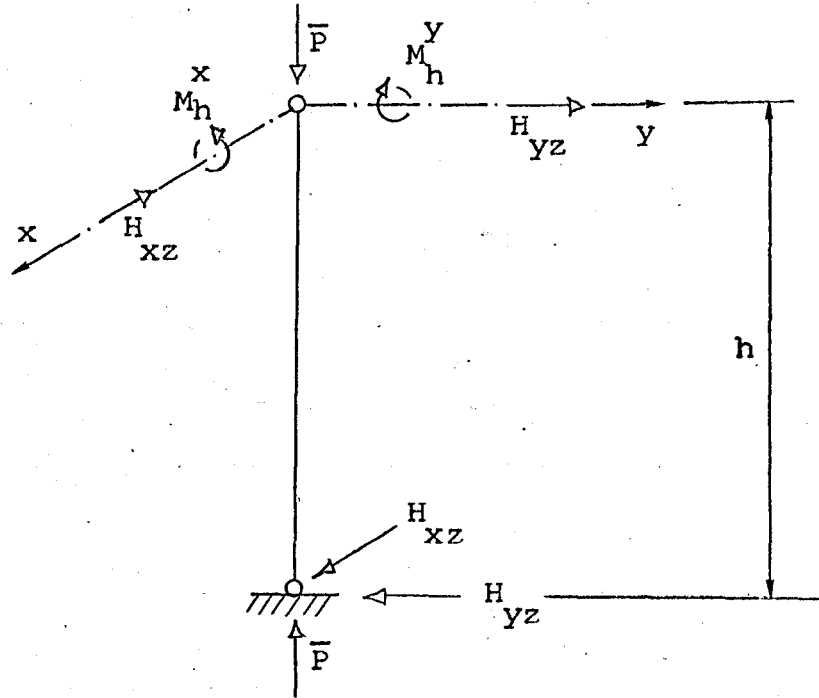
A Typical Biaxially Loaded Beam-Column
